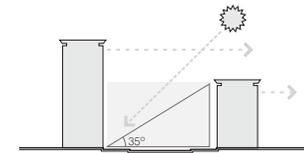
Built form along Gympie Road will define the public realm and be designed to capture views to the east and allow sun penetration onto the street space
